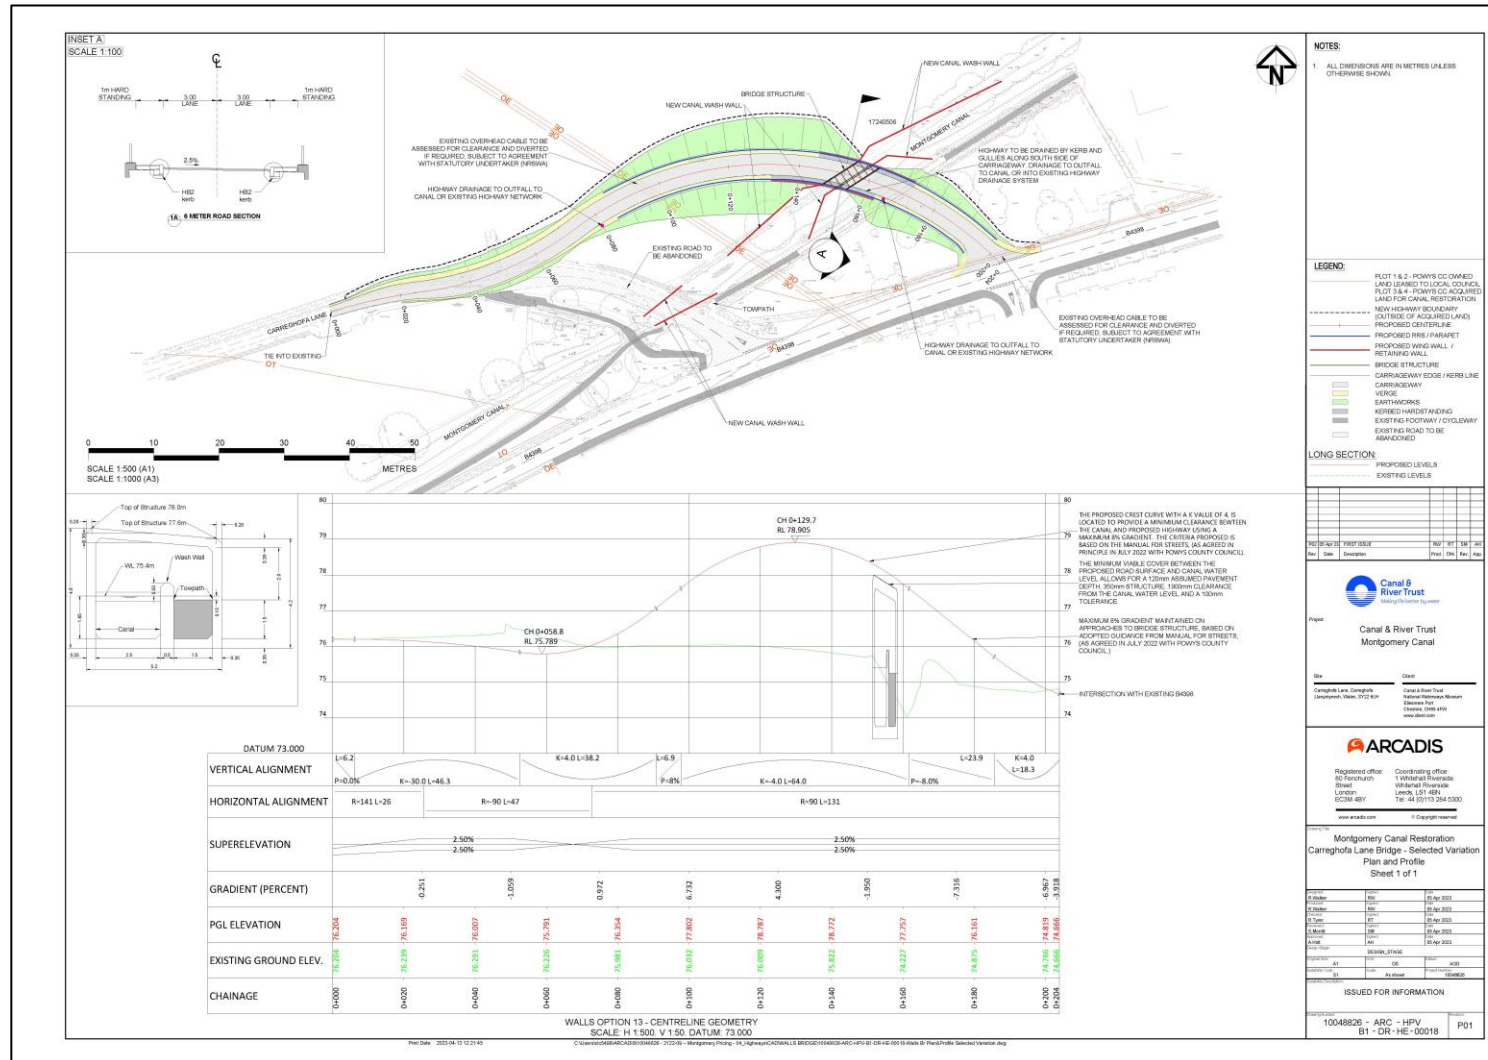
Plan and Profile of the proposed bridge (reproduced courtesy of the client)
